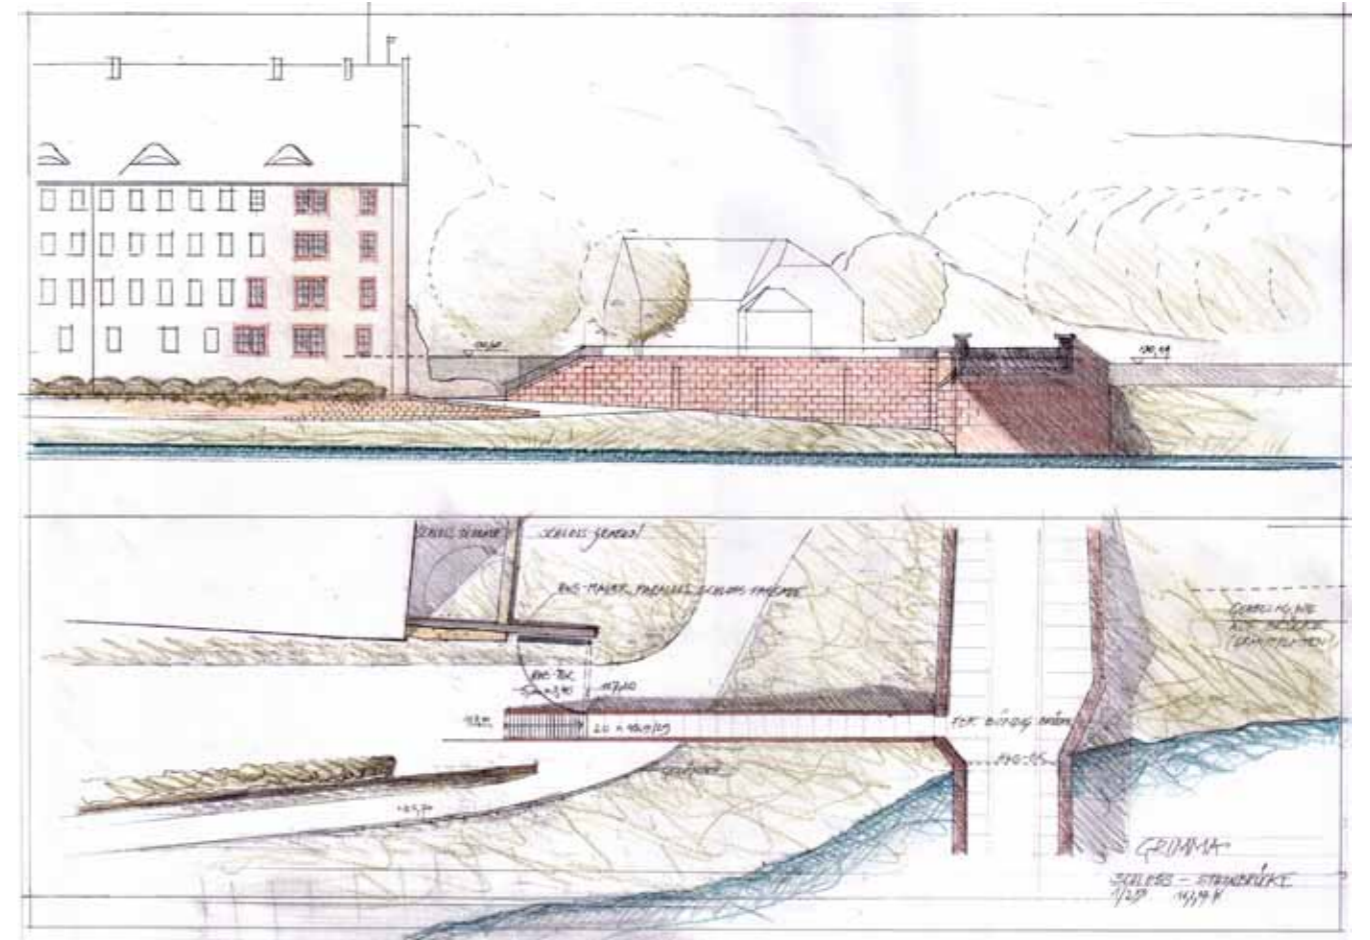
Flood protection wall supporting a new promenade approaching the historic bridge. Integrated planning proposal, layout and elevation (cf. Figs. 4.2.5.2, 4.2.5.3). Source: T. Will, H. Lieske.
